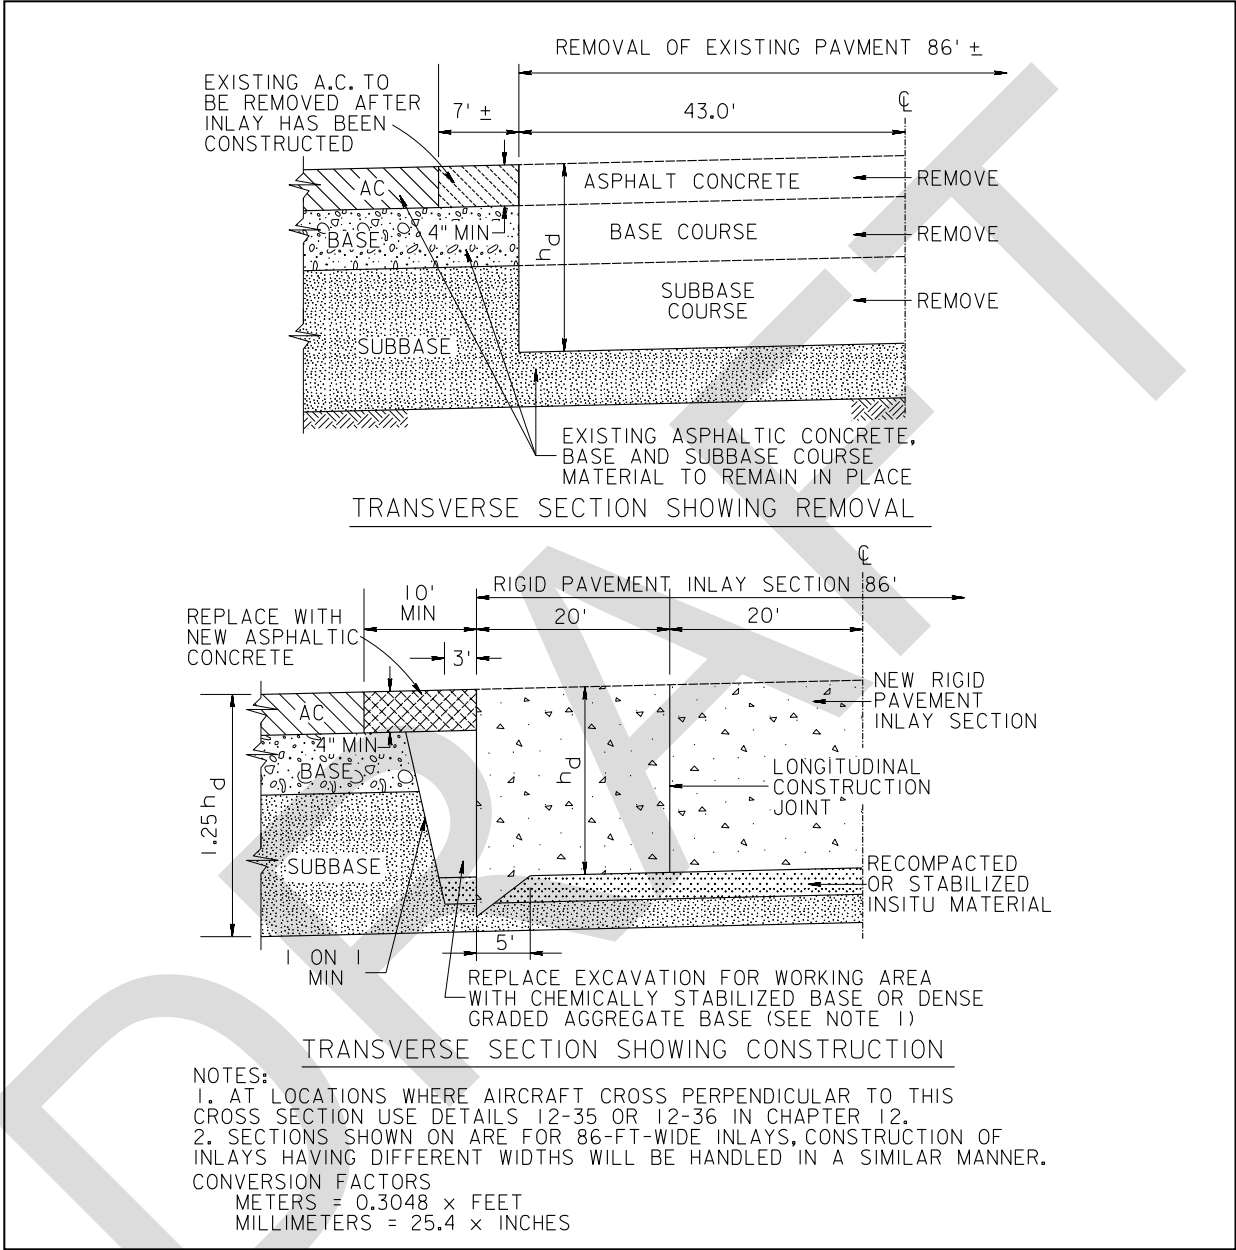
shows a section of a typical rigid pavement inlay in an existing flexible pavement. Paragraphs 18-2.1 through 18-2.8 detail the requirements for rigid inlays in existing flexible pavement.
